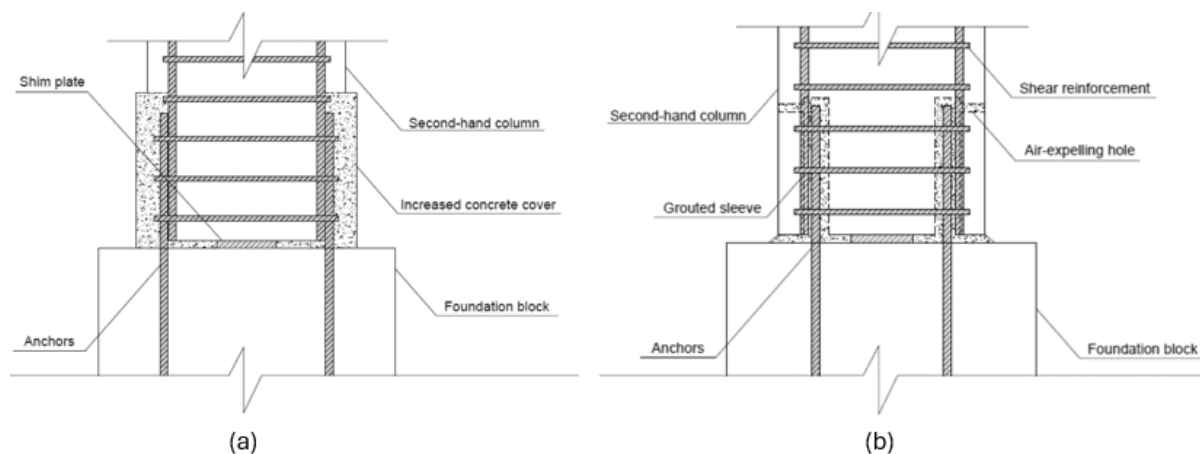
Design proposals for reconnecting a reused column to a foundation block (Volkov, 2019) (continued on next page)
